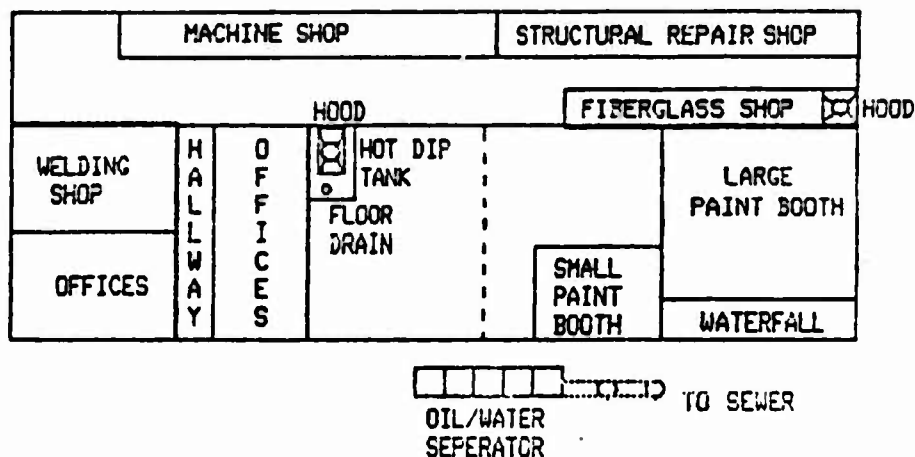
35th EMS FABRICATION SHOP FLOOR PLAN
